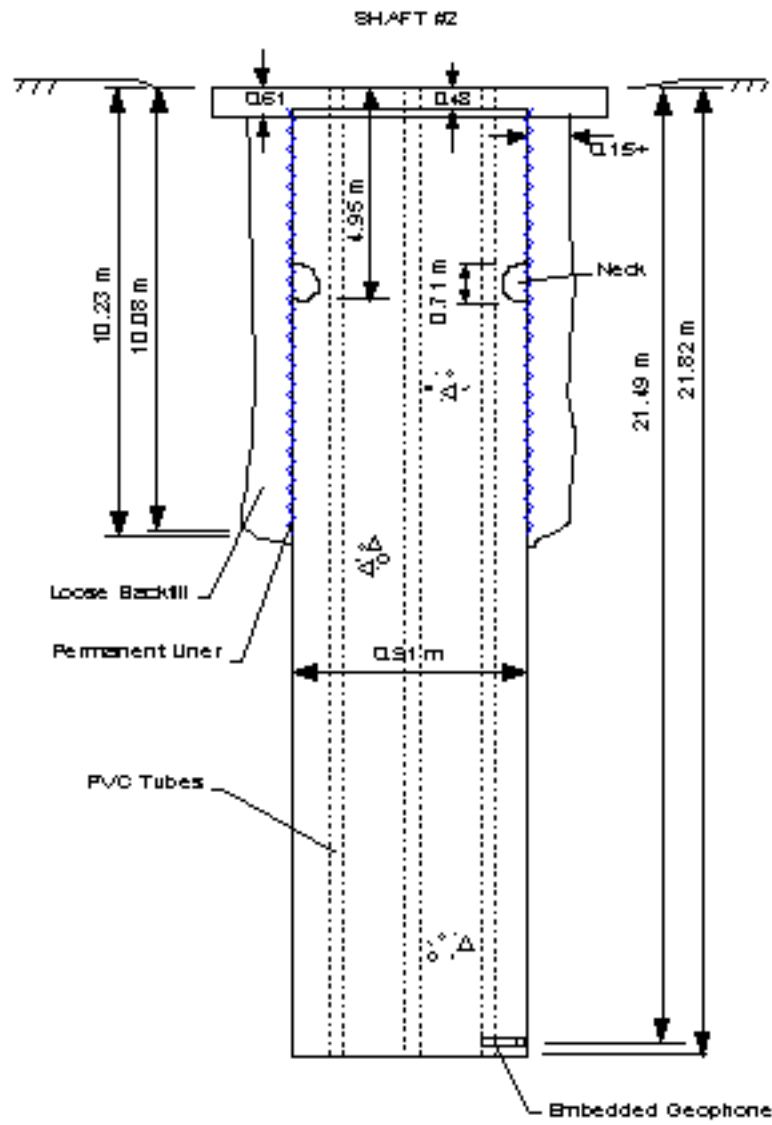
Detailed Schematic of Shaft 2 - Inaccessible-Head Condition
